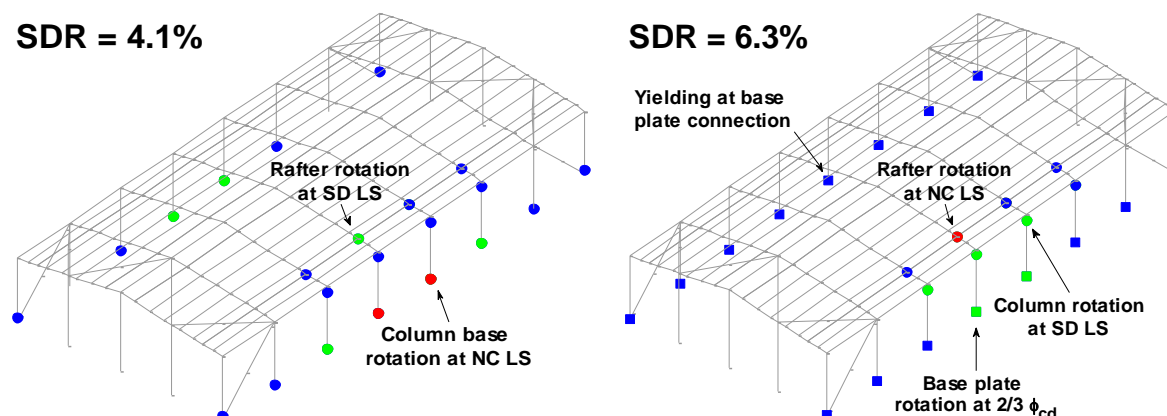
Transverse collapse mechanisms of the building with fixed base plate connections, FBPC, (right) and the building with nominally pinned base plate connections, PBPC (left).
